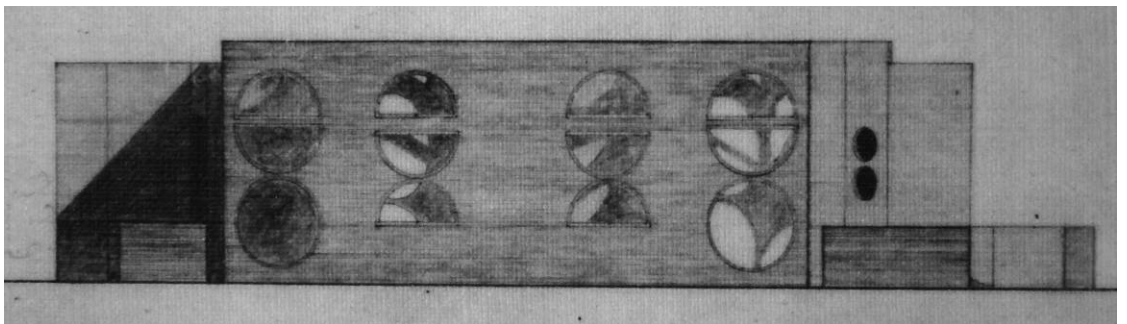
Elevation for IIM School Building, mid 1964.
